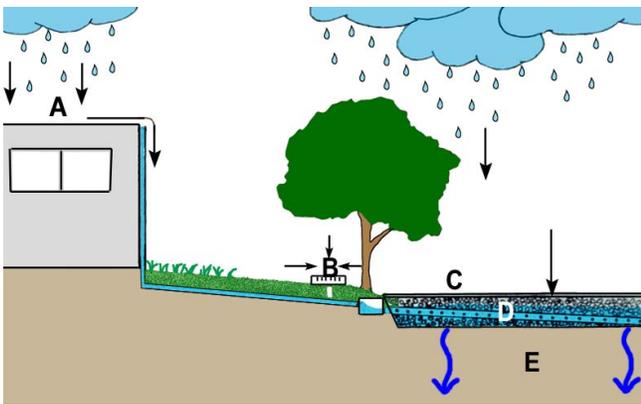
Conceptual schematic showing roof drains tied directly into infiltration bed below porous pavement
